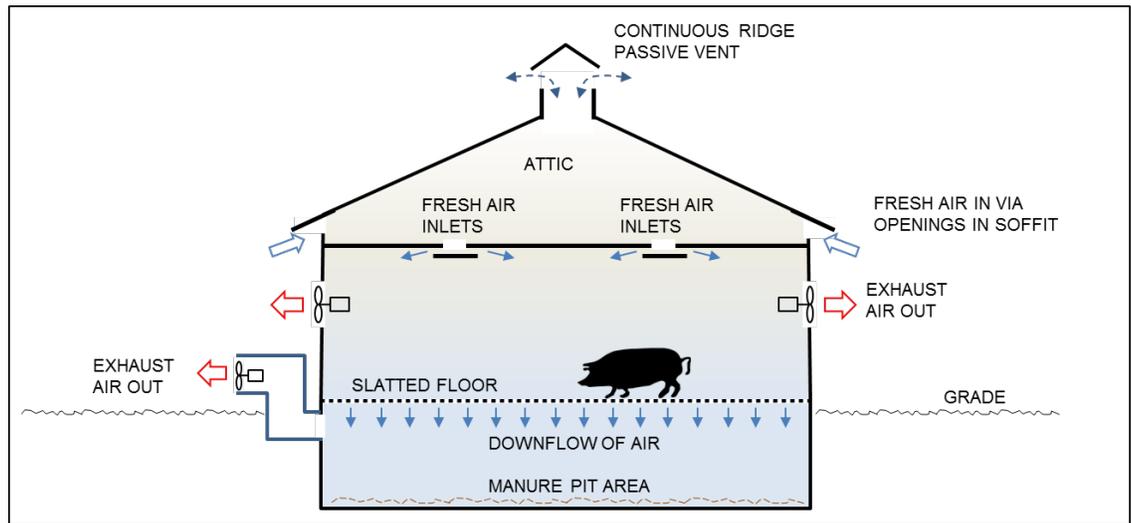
Attic Inlet Plenum with Pit and Side Wall Exhaust Fans Concept
